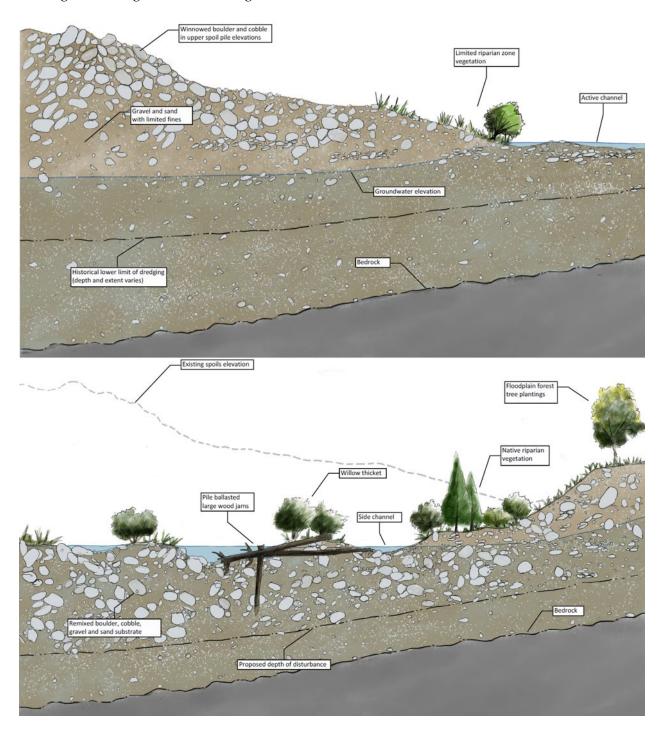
Illustrated cross sections showing a concept of existing conditions (top) and a proposed conditions example of a reconstructed floodplain and channel (bottom).
